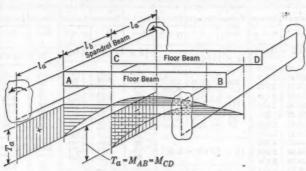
Torsion Distribution for Two Symmetrical Floor Beams
